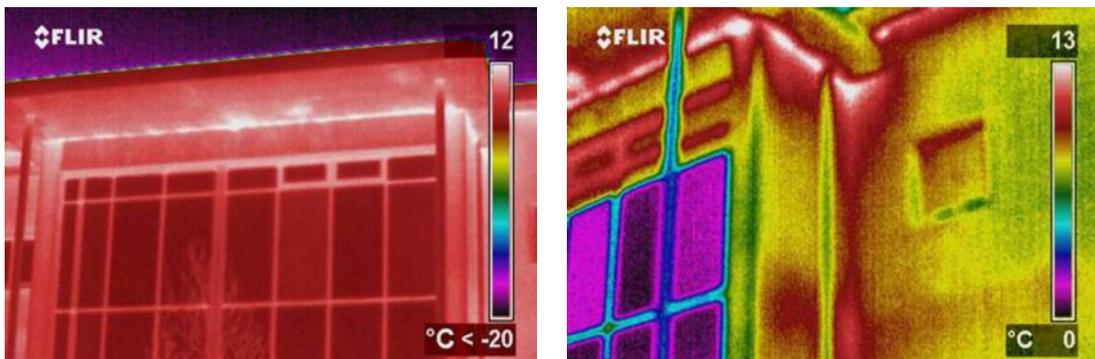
Building B thermography: thermal bridges at wall-to-roof and wall-to-wall junctions
